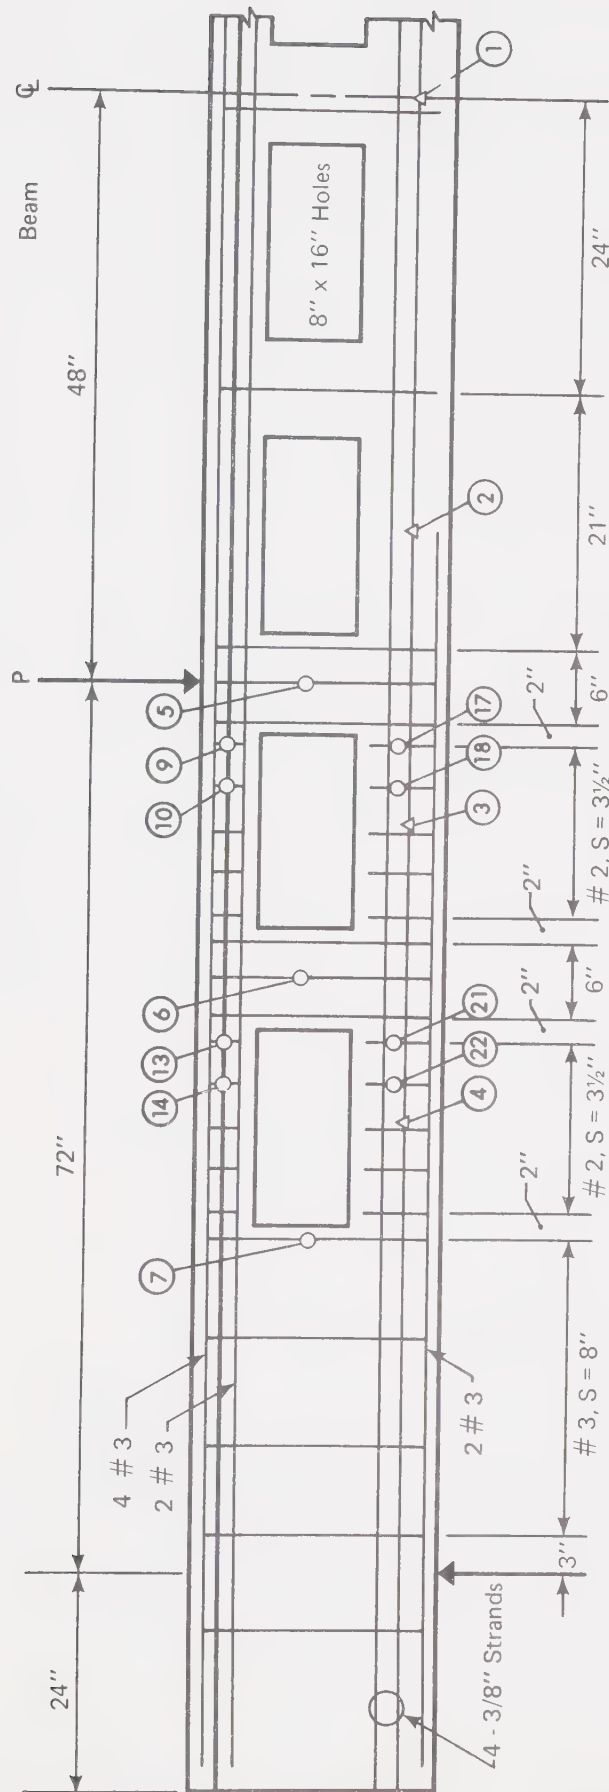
Reinforcement Details and Strain Gage Locations for Beam 1-16-6
